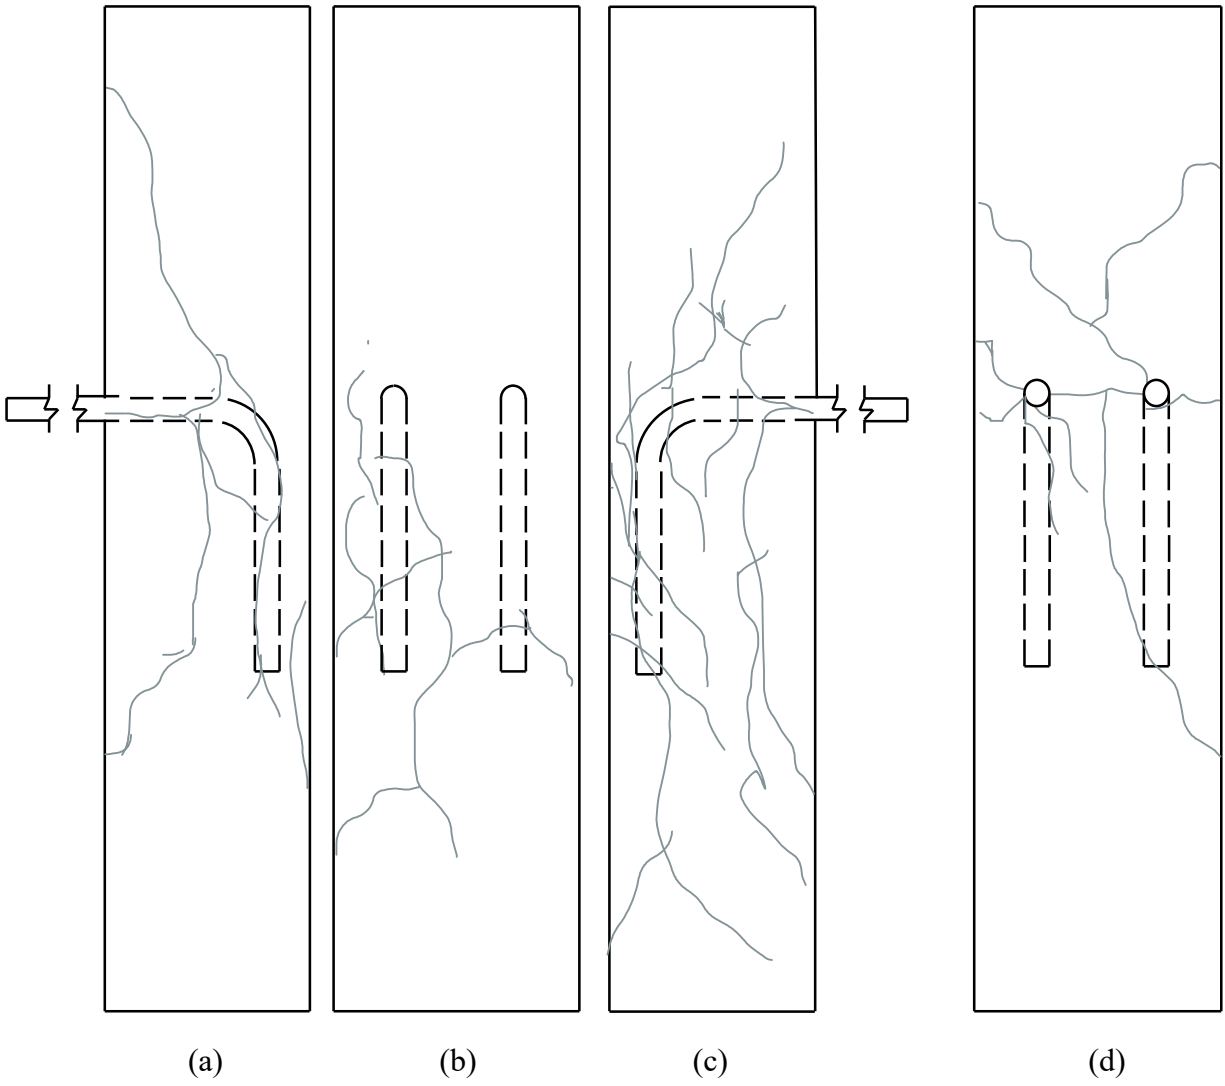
Crack pattern at maximum normalized tensile load for beam-column joint specimen P1-90: (a) west side face, (b) back face, (c) east side face, and (d) front face
